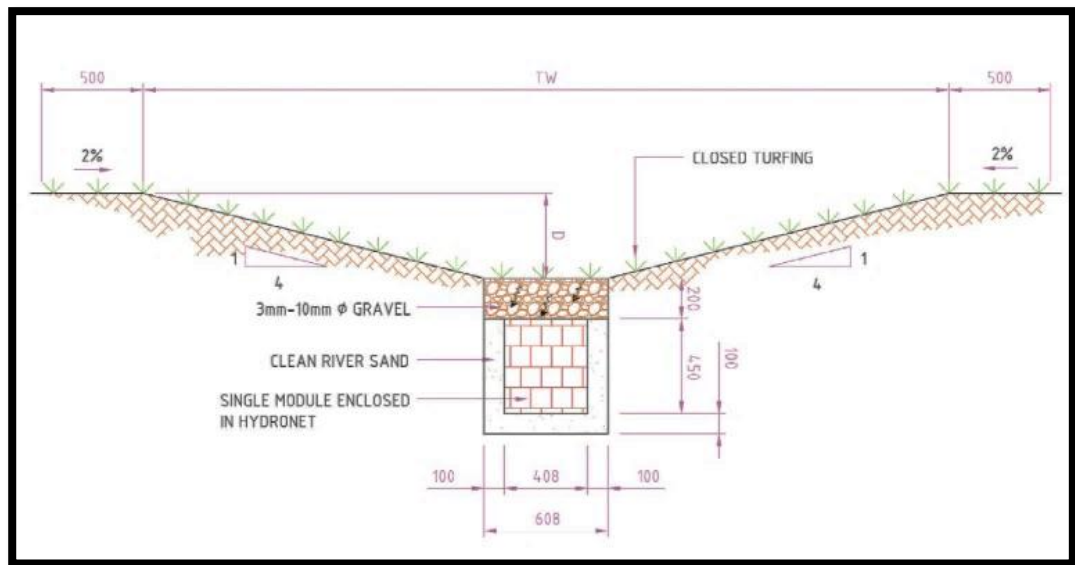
Cross section area of a Subsurface Conveyance Conduit (Lai et al., 2009)
